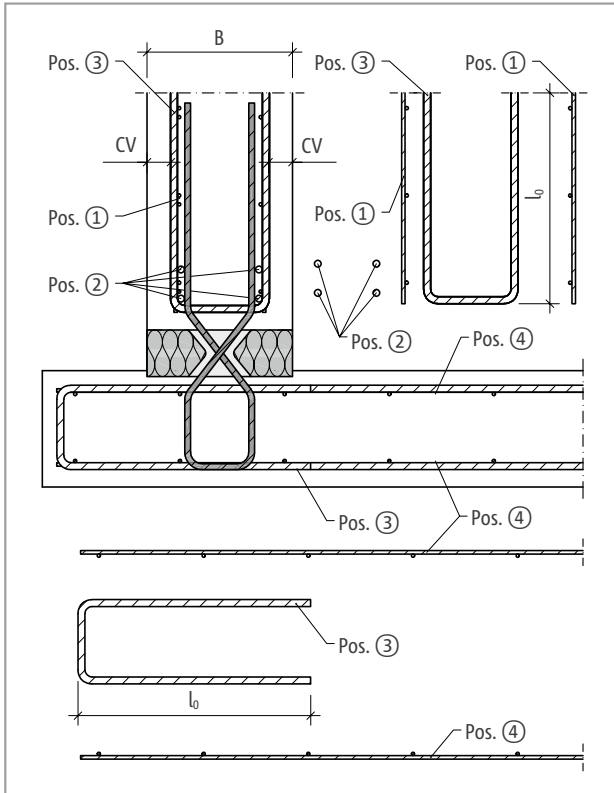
Schöck Sconnex® type W-N-VH: Variant A – on-site reinforcement for connection at base of wall
